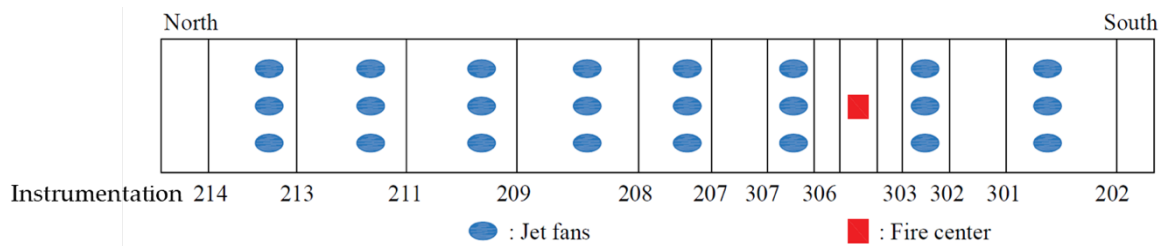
Layout of the ventilation systems in the Memorial Tunnel Test No. 621A (adapted from [80])
